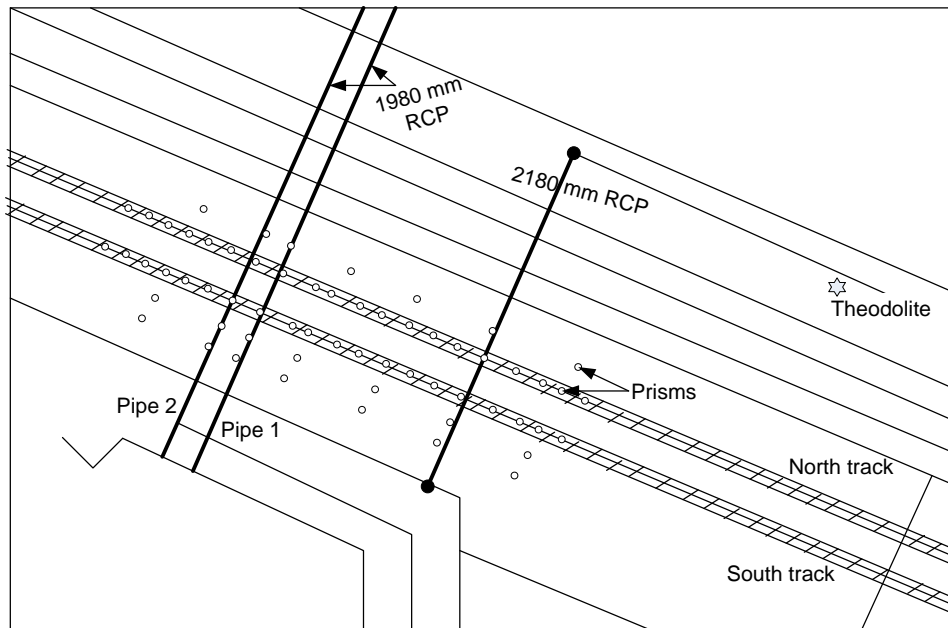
Ground deformation monitoring point layout plan (*adapted from Jensen et al. 2007*).
